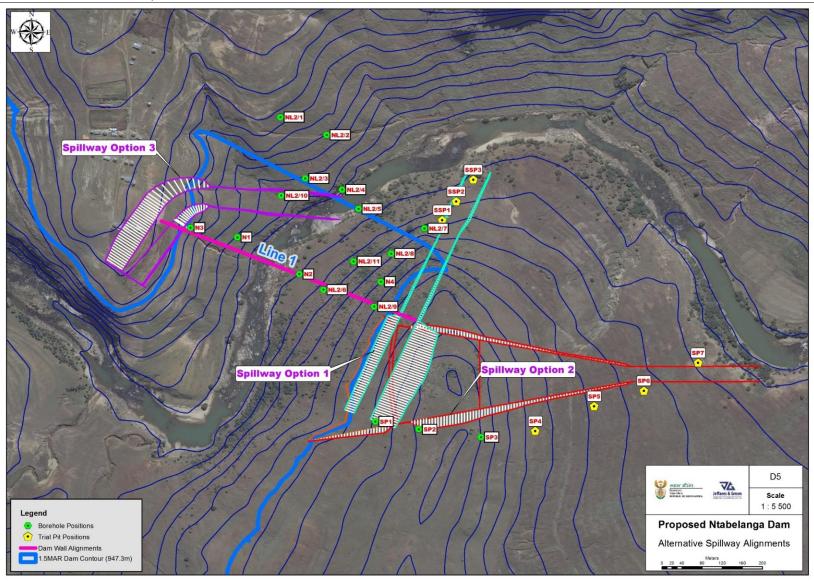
Site Plan Showing Alternative Spillway Alignments
